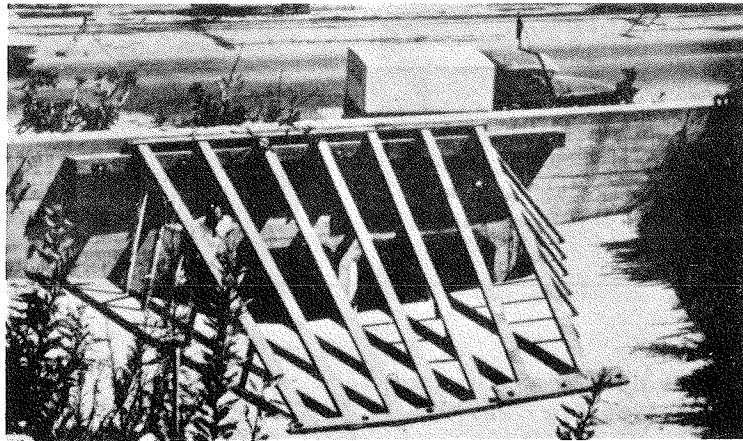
Steel grill debris rack with provision for cleanout afforded by concrete paved area in foreground.
